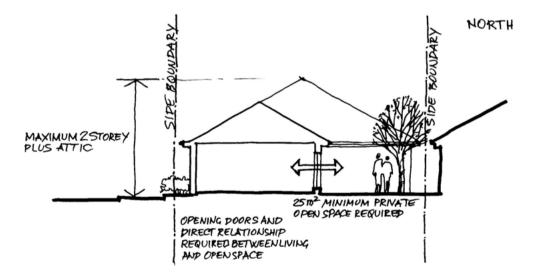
Cross section of single storey courtyard dwelling.
